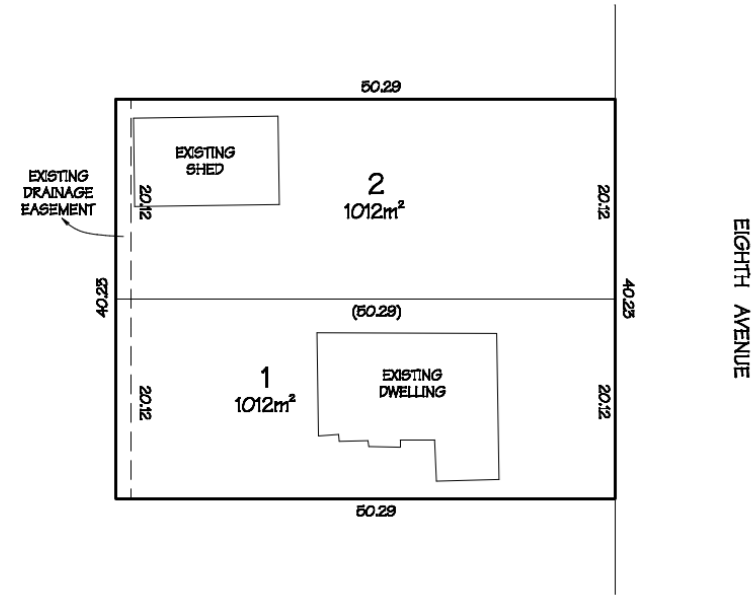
34-36 Eighth Ave Proposed Subdivision
